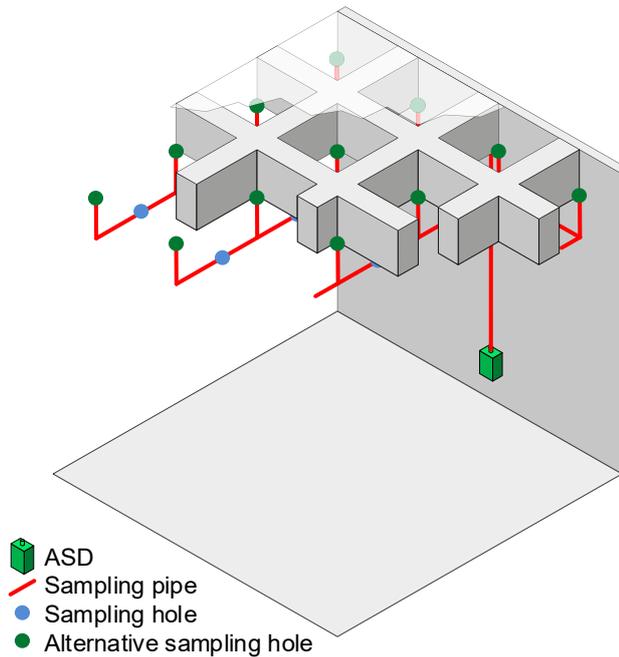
Fire detection placement (underside ceiling – deep beam/joist)
